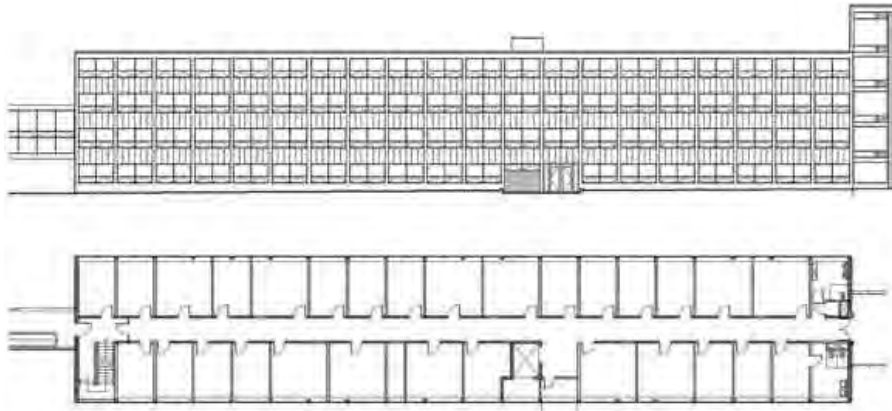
Block C: existing floorplan and west elevation. (Drawn by Tobi Kennedy)
